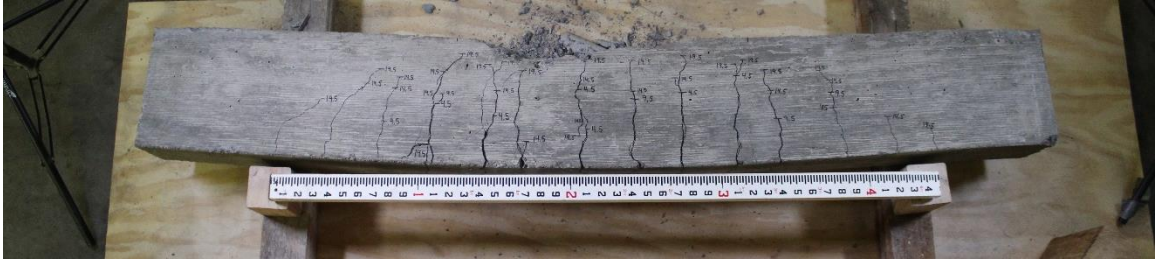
Mixture 1 (100PC) beam #20: concrete beam side view.
